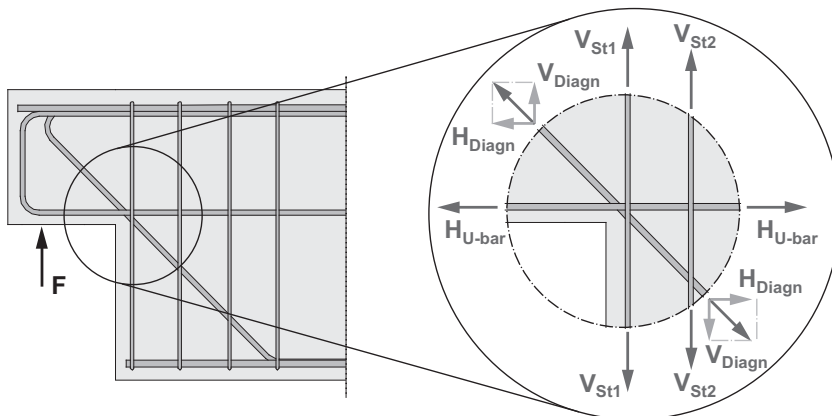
Forces in the steel reinforcement at the re-entrant corner for specimen NS-REF.
